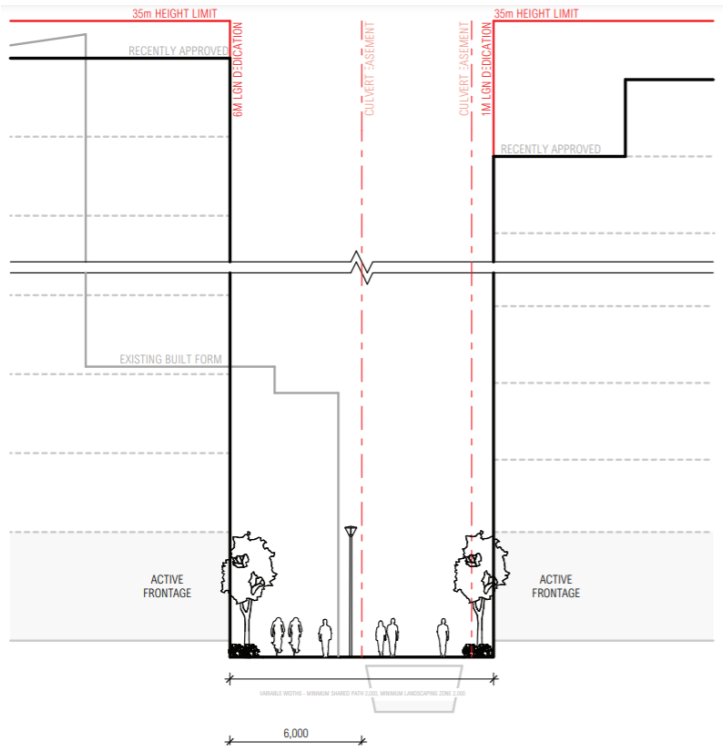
Indicative street section – Mandible Street, North Alexandria
